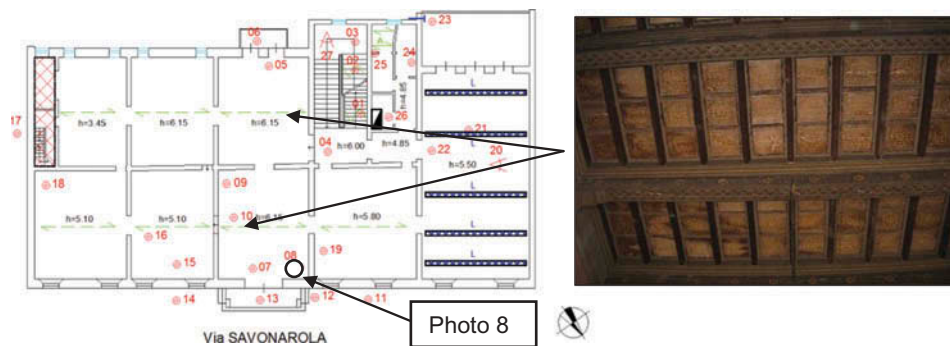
Beam layout of the first floor (left) and photograph #8—details of the wooden floor (right).
